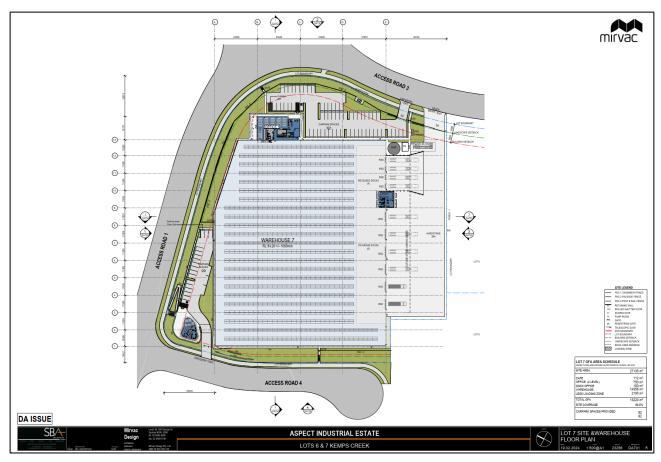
Proposed Warehouse 7 & Estate Cafe Site Plan
